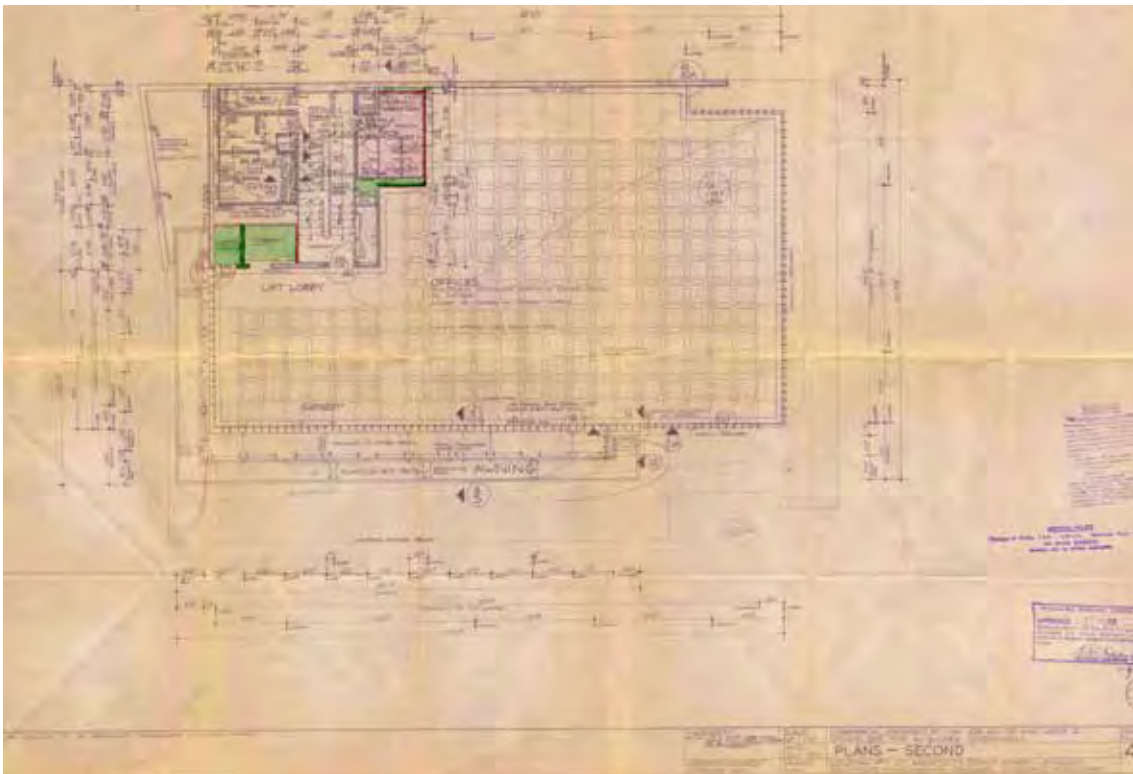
| Second floor plan of the Gruzman design. The service areas have been altered since and the coffered ceilings were never constructed. (Source: BA file BA 1546/1971)
